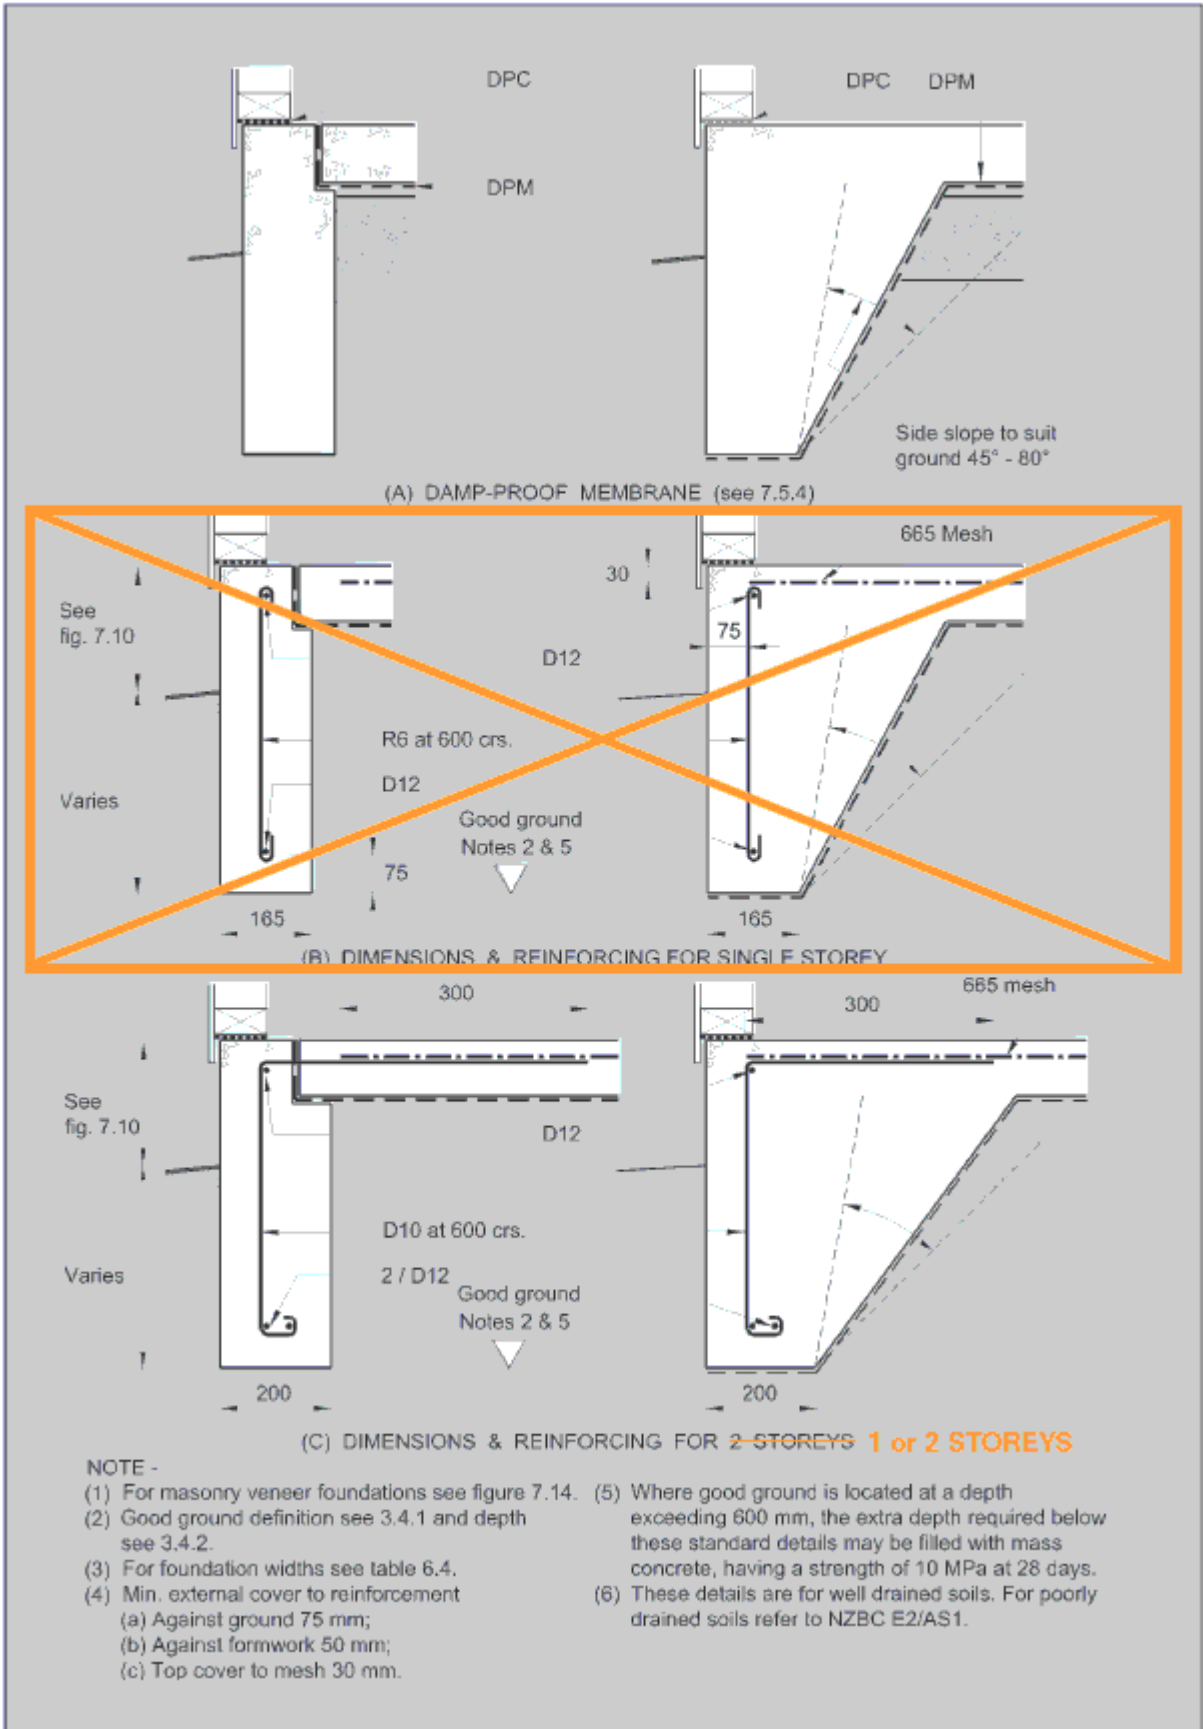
Foundation edge details - In situ concrete (see 7.5.2.3)
